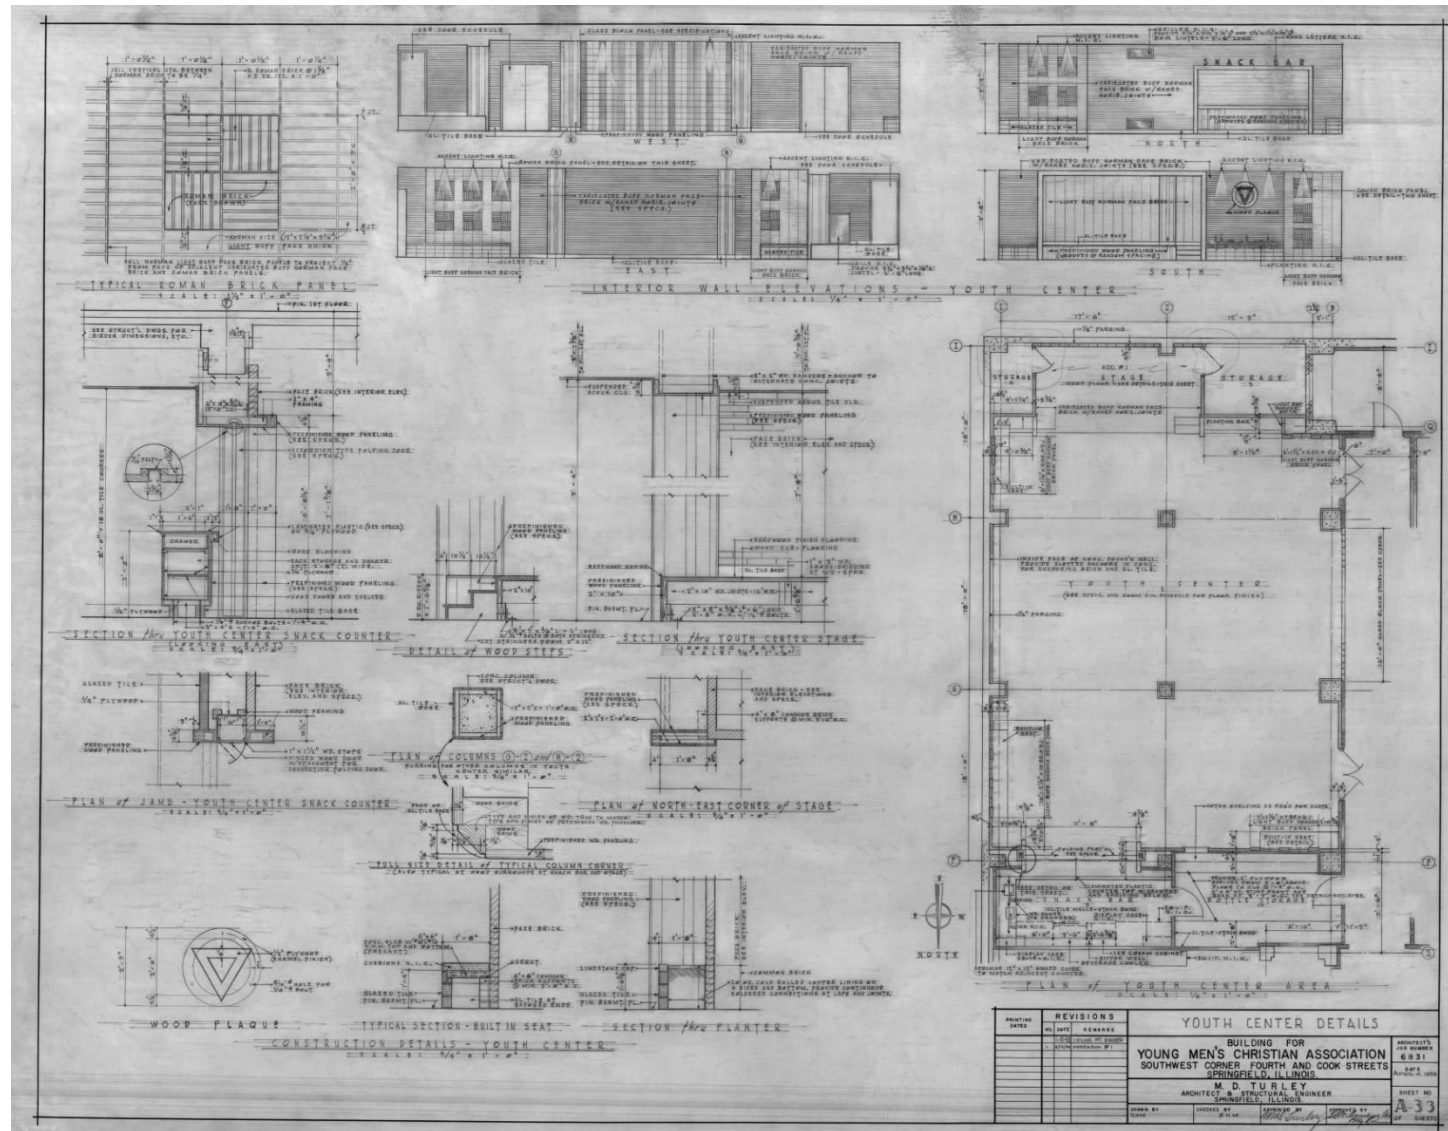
Youth Center Details, Building for Young Men's Christian Association (Turley 1958, Sheet No. A-33).
